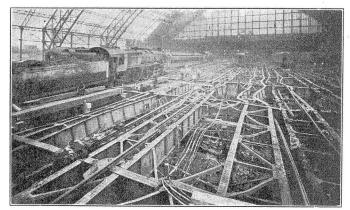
Supporting Beams and Track Were Distorted by Heat
